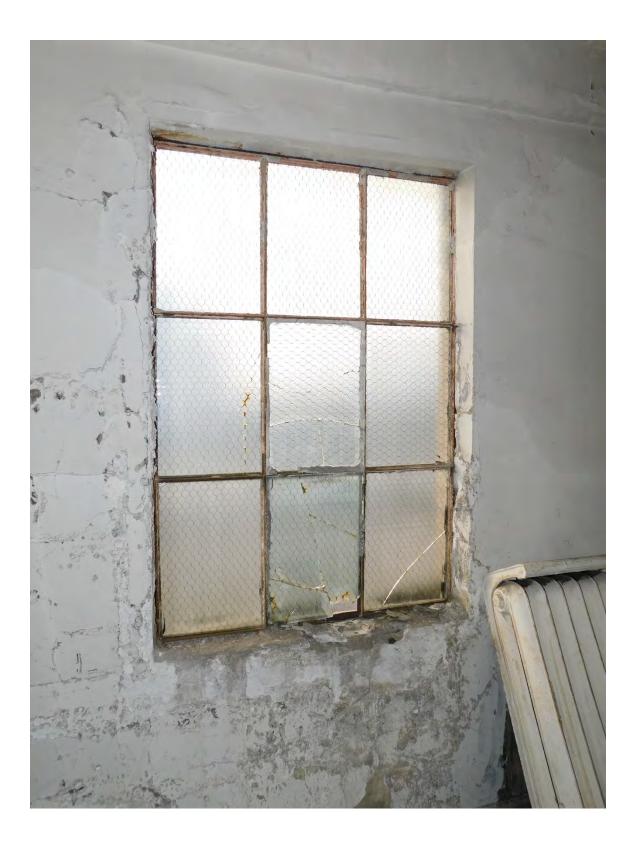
Interior, 3<sup>rd</sup> Floor, Looking West. 12/6/19
